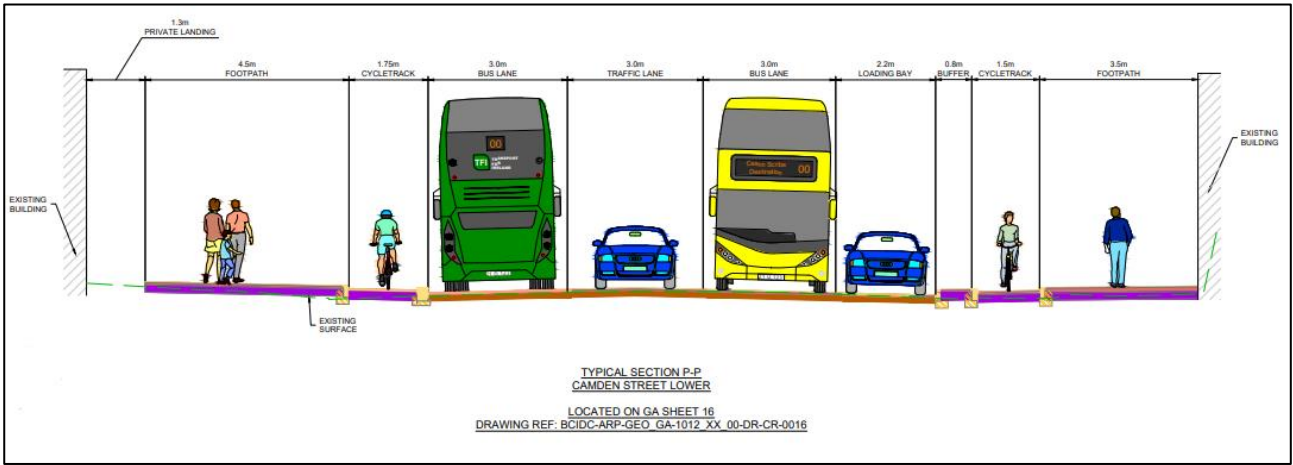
Typical Cross-Section adjacent to 72-73 Camden Street Lower
